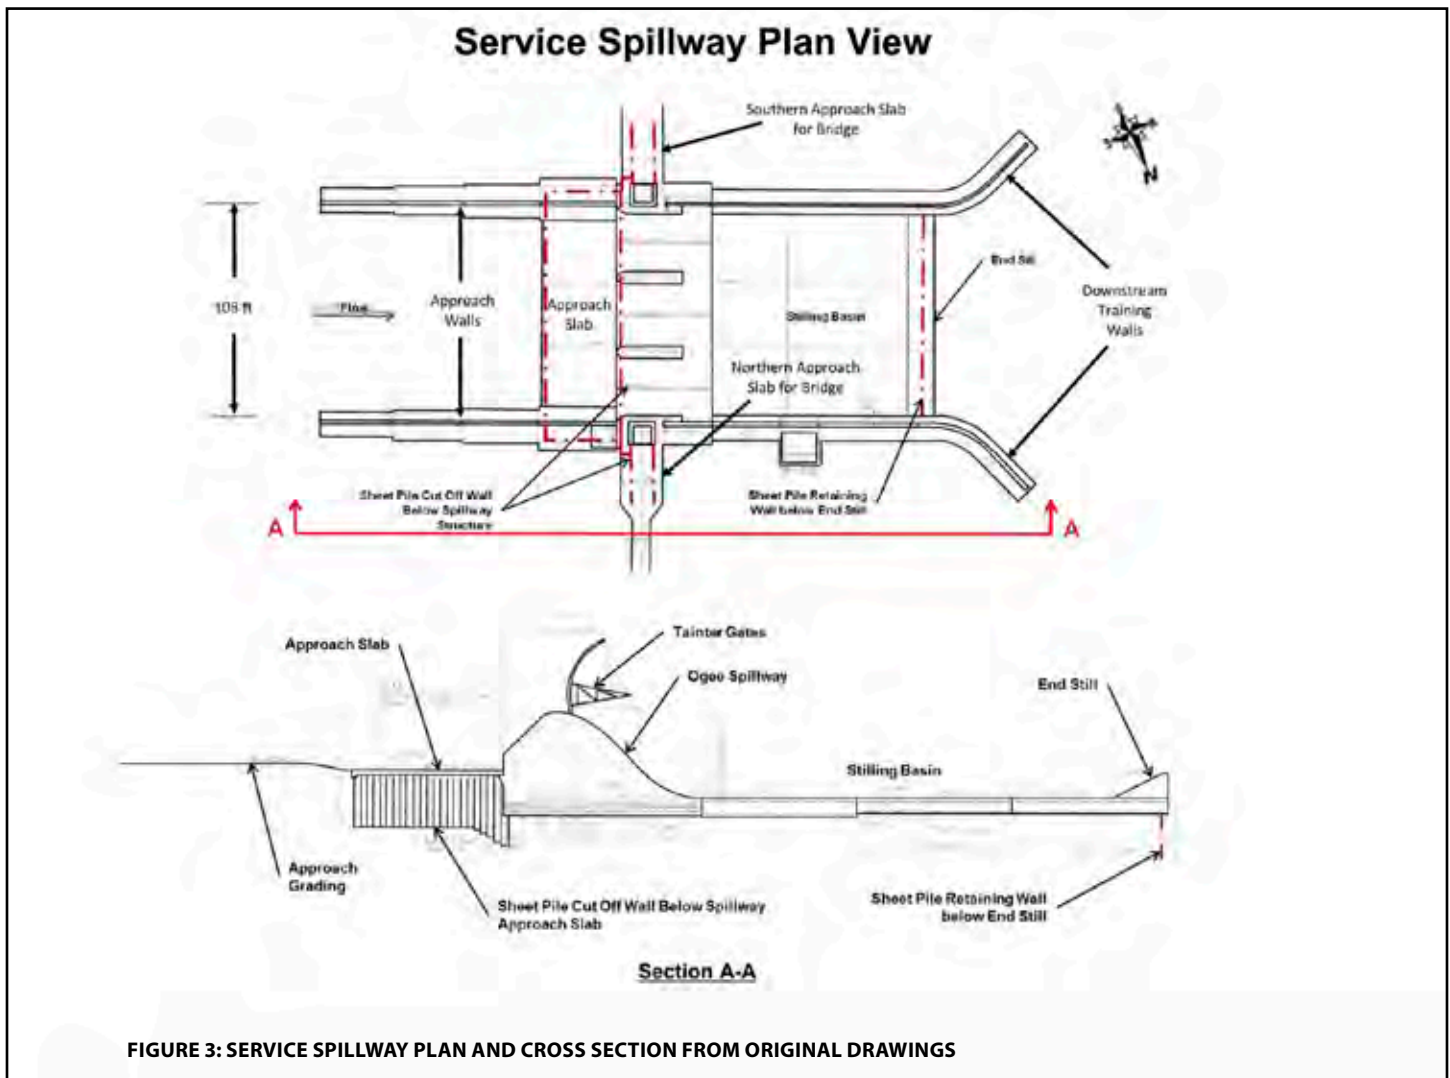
SERVICE SPILLWAY PLAN AND CROSS SECTION FROM ORIGINAL DRAWINGS
